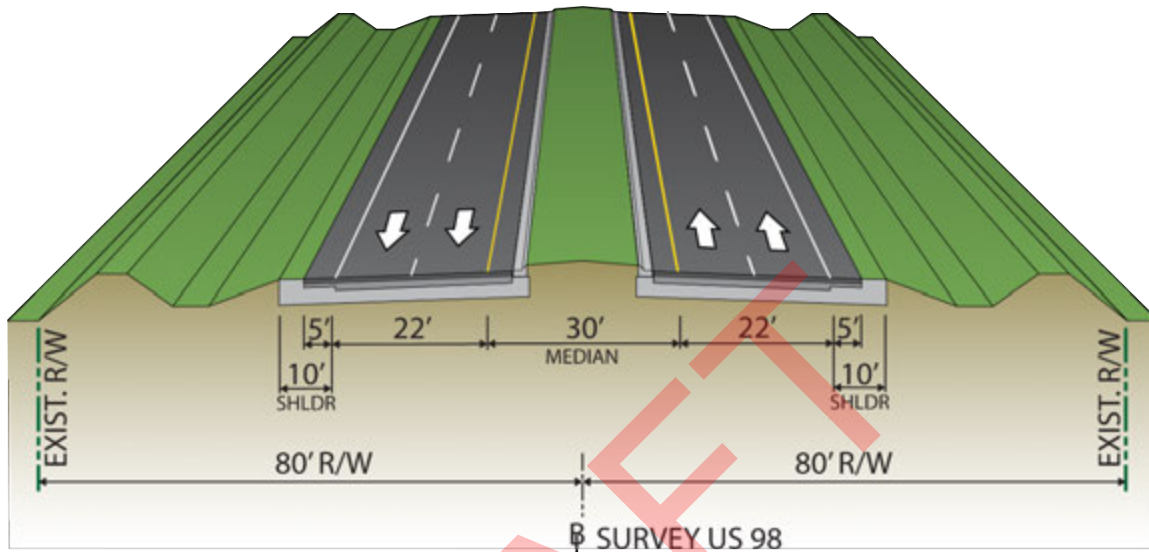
Proposed US 98 C2 (Rural) Typical Section
